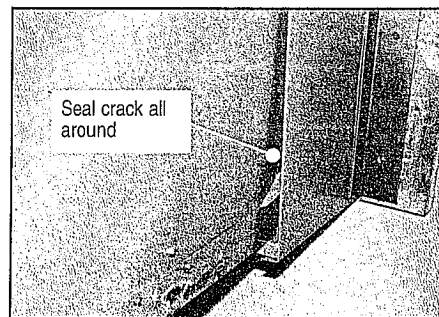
For additional protection against air infiltration during periods of very high winds, fill the clearance space between unit and wall sleeve all around with sealant.
